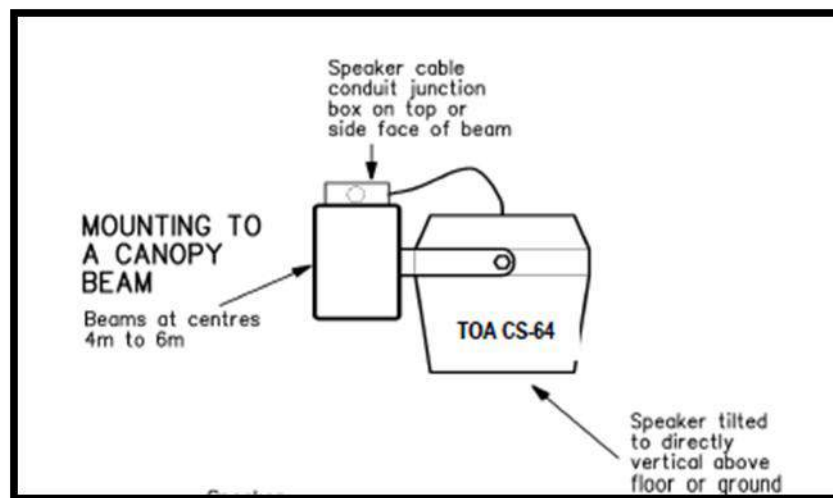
Mounting to a canopy beam (Technical Standard Part 129016)
